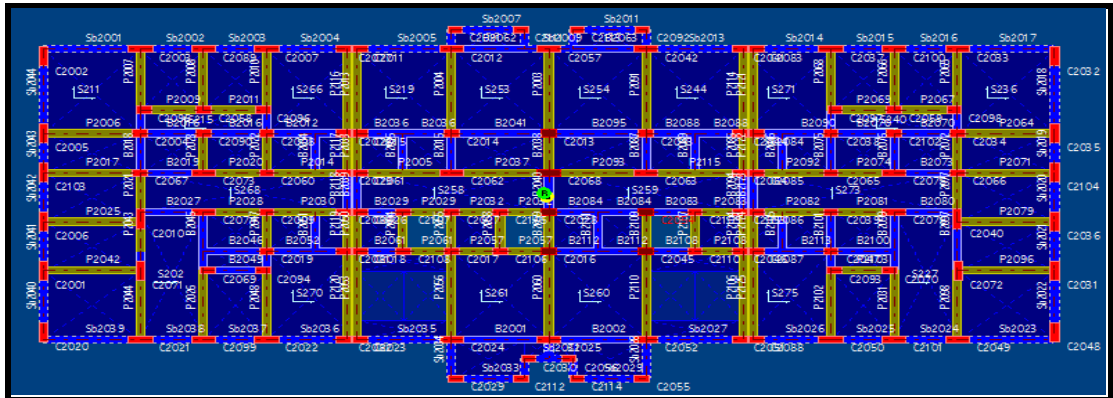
Plan of Twenty Five Stories and Tunnel Formwork System
